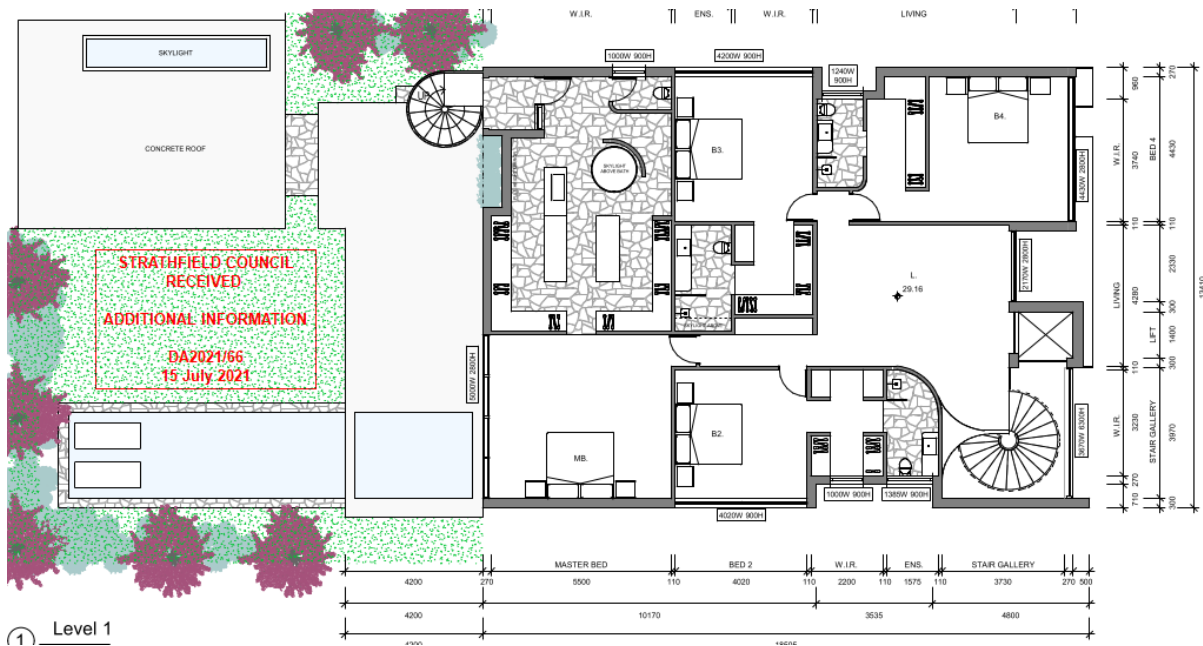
Extract of the proposed first floor plan, received by Council on 15 July 2021.
